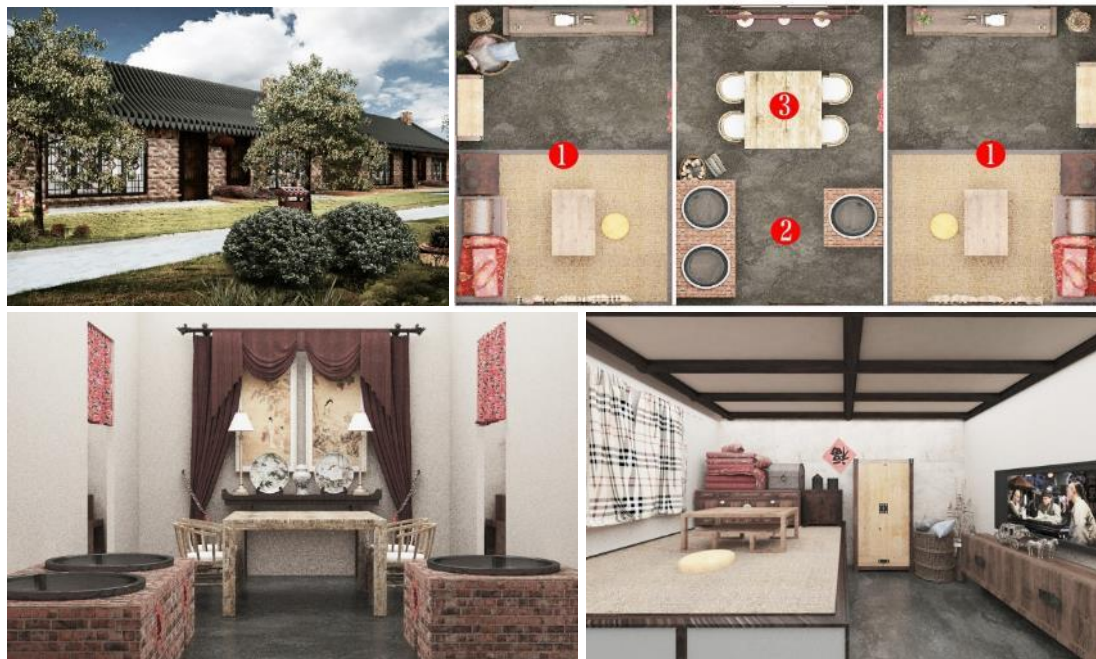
Renewal of the residence (Façade, Interior plan, kitchen and dining room, Living Room)
